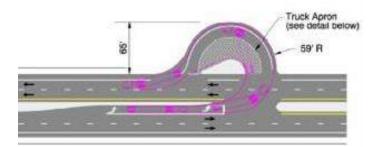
Example of Potential Opportunities to Facilitate U-turns by Widening Intersections
